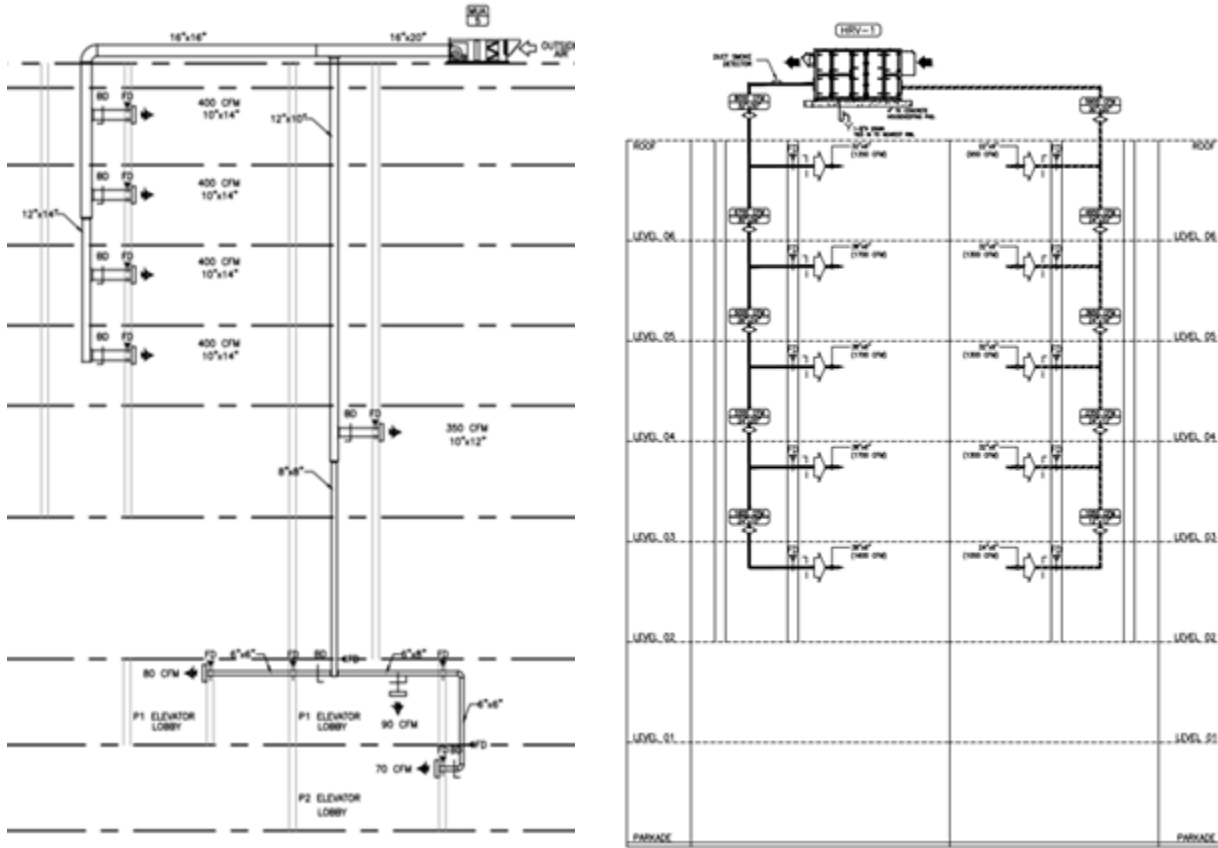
Building cross-section featuring air handling units for Lot E (left, only half of building shown) and Site B (right)
